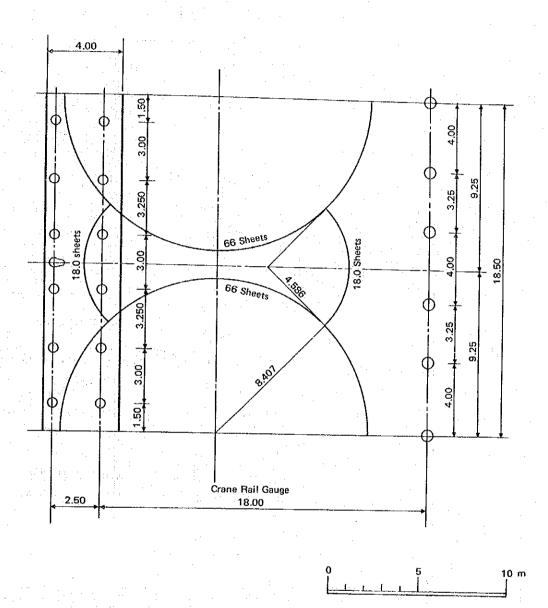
Typical Cross Section of Quaywall for 6th Berth
